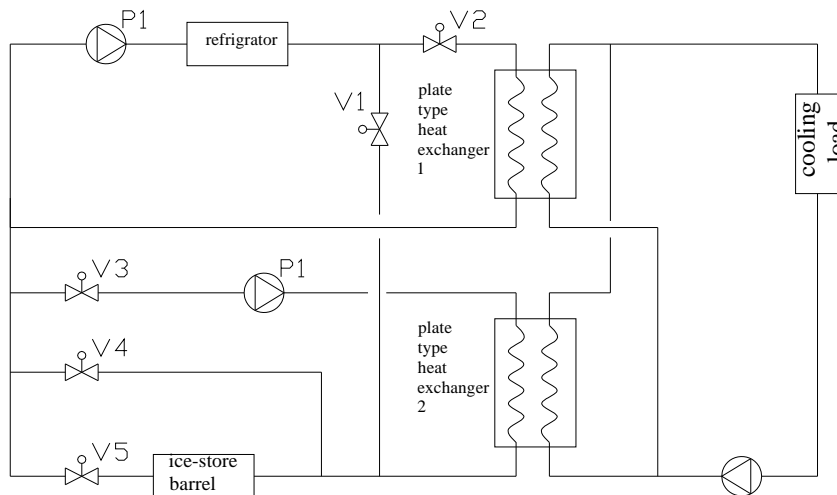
Double pump, double plate type heat exchanger, refrigerator and ice-storage machine parallel operating mode.
